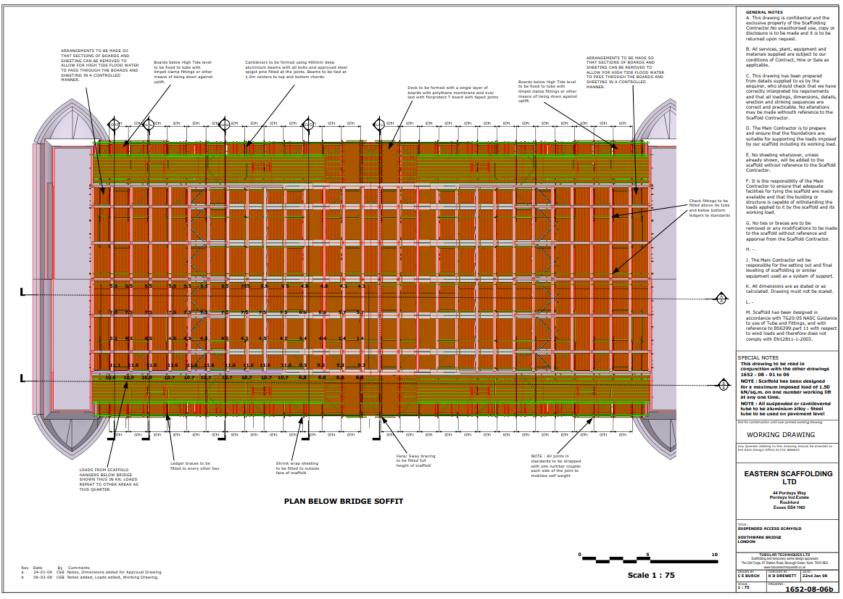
Scaffolding used on Southwark Bridge [6/6]
